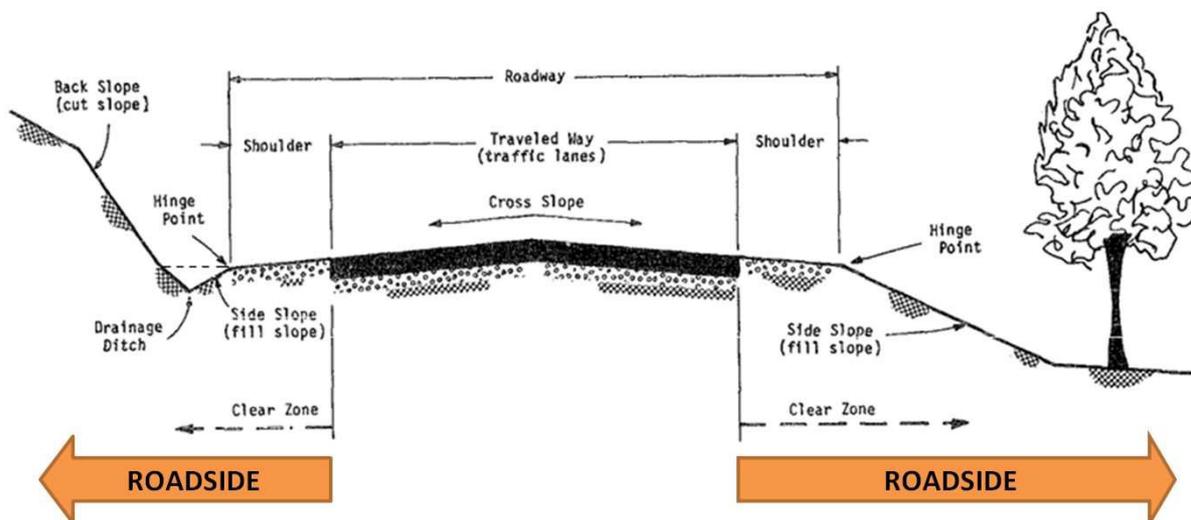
Roadway cross section with examples for roadides with clear zones [2]
